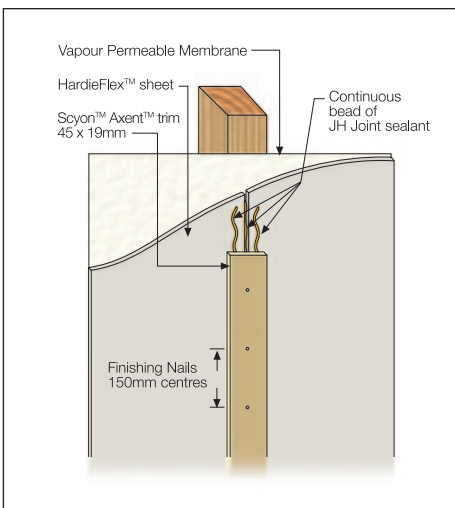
ABUTMENT HARDIEFLEX SHEET VERTICAL DETAIL
